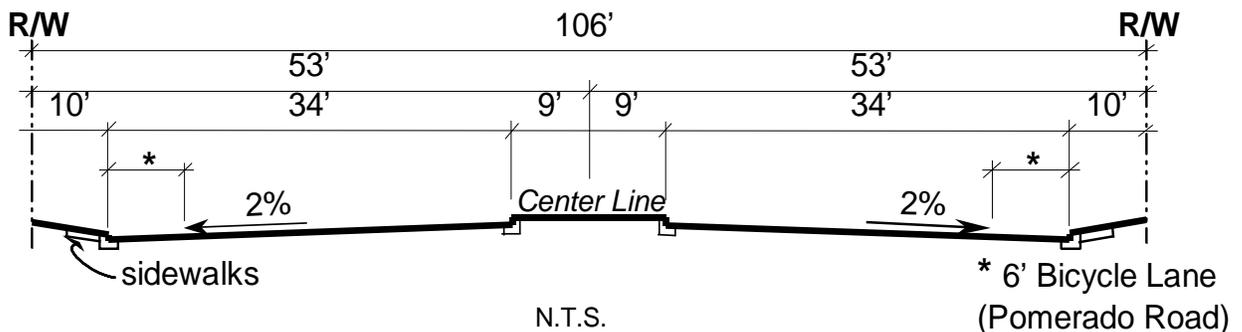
MAJOR ARTERIAL – TYPICAL SECTION
